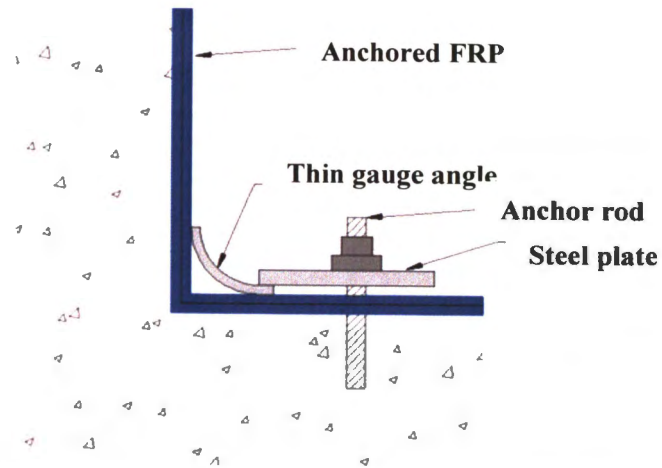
Ductile Anchorage System Used in Hall et al. (2002)
